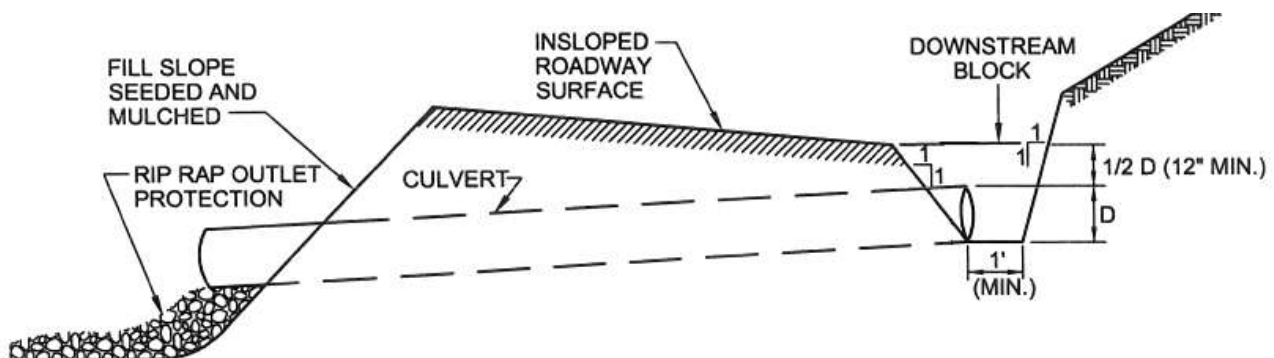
Cross drain detail (from PA Department of Environmental Protection)
